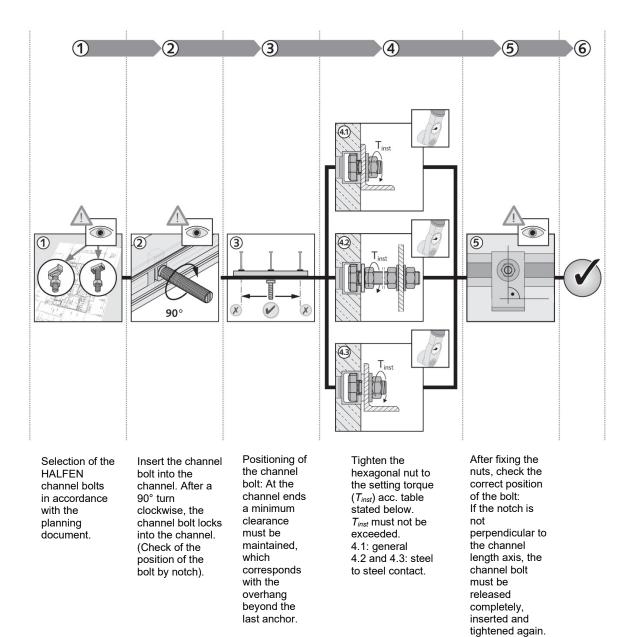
FIGURE E—HZS CHANNEL BOLTS: INSTALLATION INSTRUCTIONS
